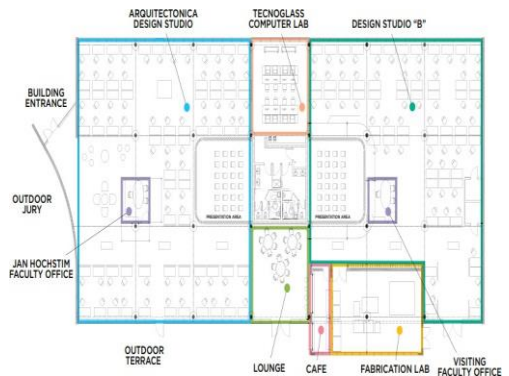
Thomas P. Murphy Design Studio Building Floorplan
